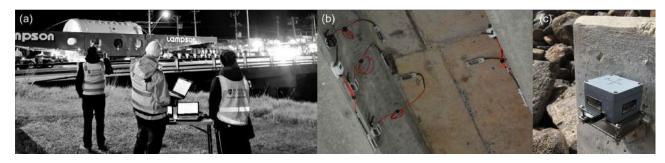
(a) Smart Structure Team monitors bridge subject to "superload" (b) Wireless concrete strain transducers on bridge girders and slab (c) Wireless tiltmeter on concrete bridge pile cap
